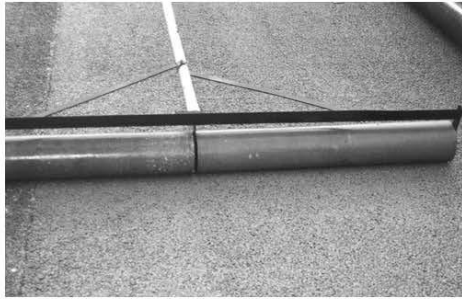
Secondary roller used for cross-rolling pervious concrete to improve the ride quality of pavement.
